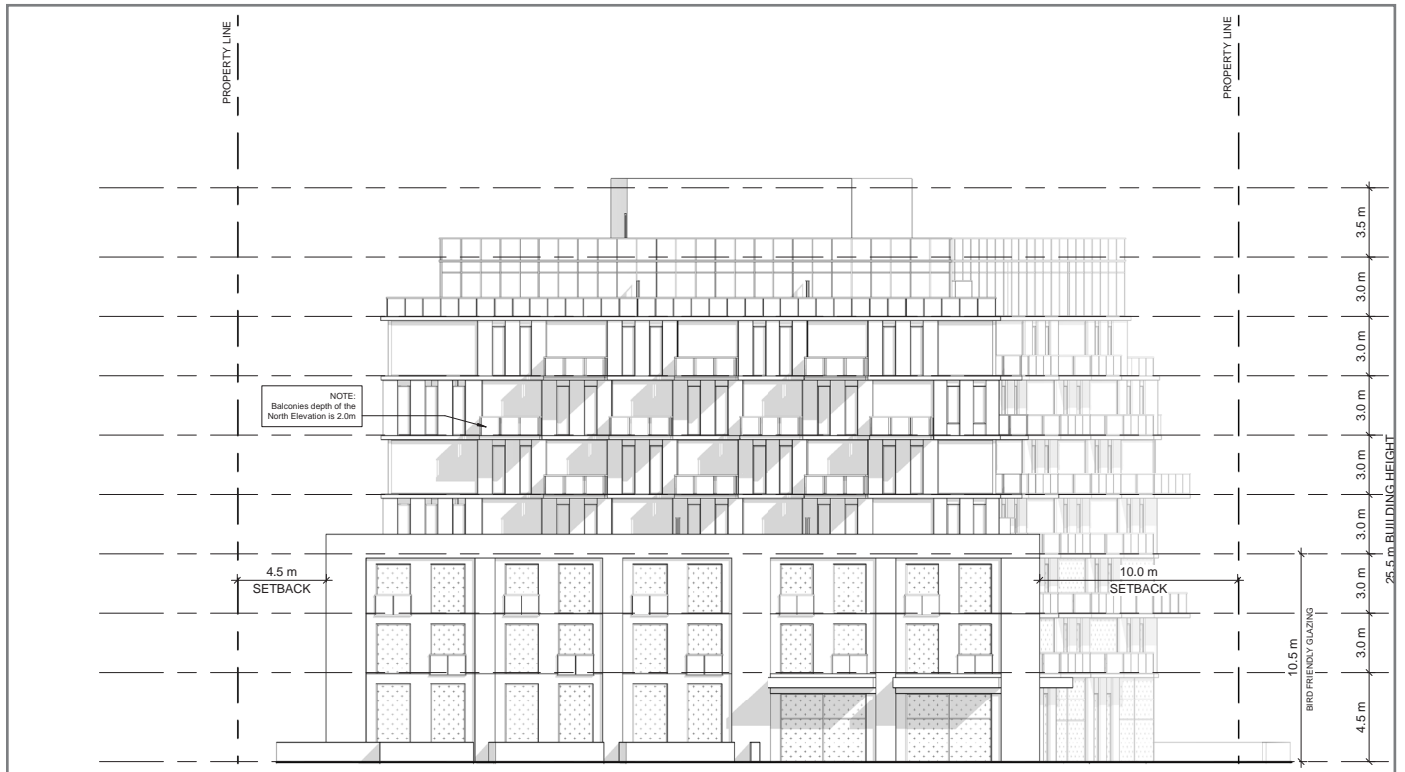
East Elevation Prepared by KFA architects + planners inc.
